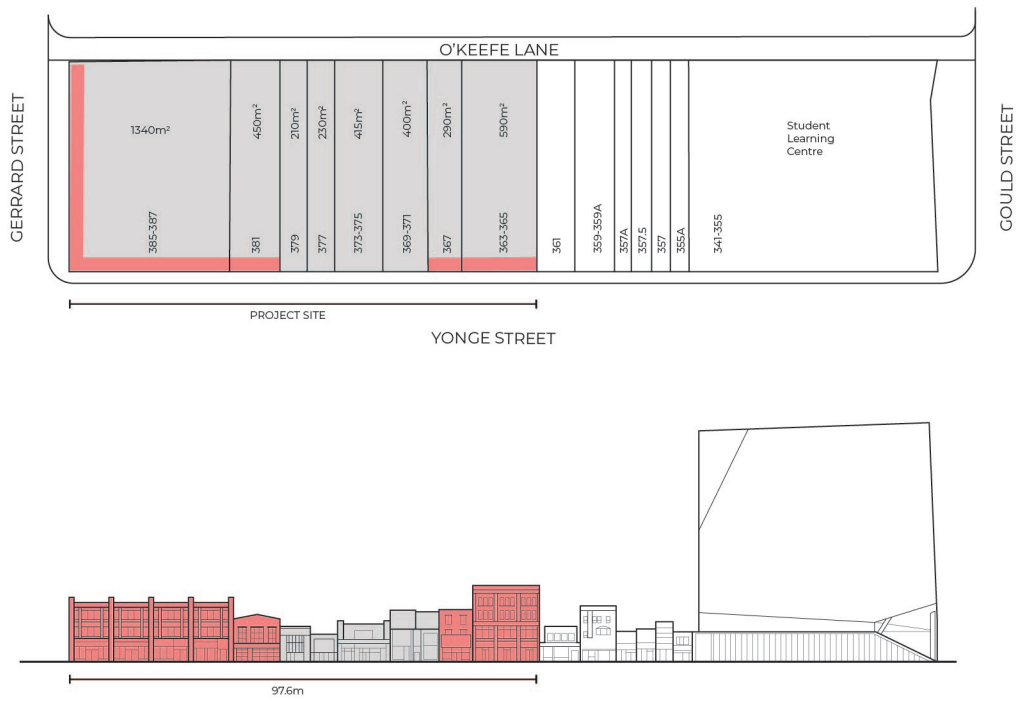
Proposed development plan and street elevation showing what is to be demolished and retained
